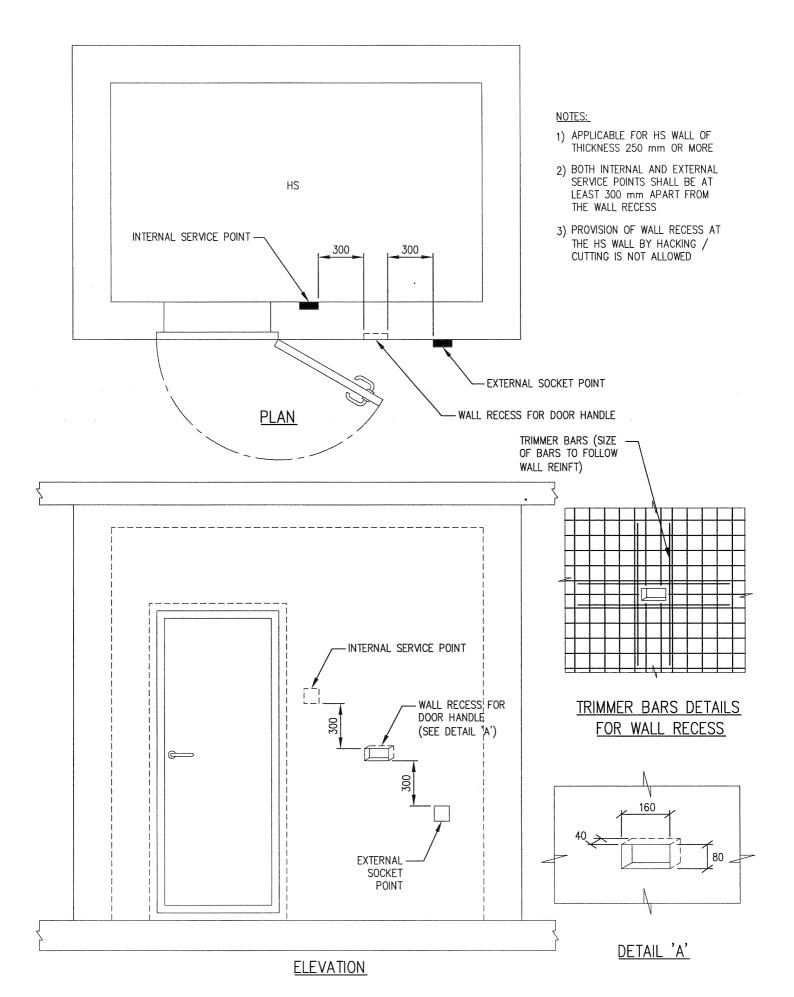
DETAILS OF WALL RECESS FOR HS DOOR HANDLE
